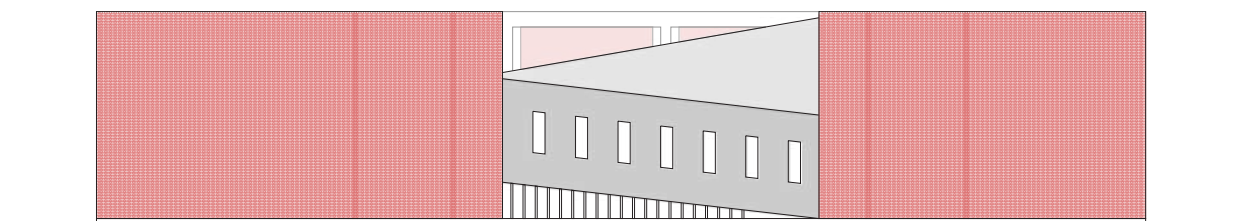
Front Elevation of the Clubhouse at Golf Course; Illustration showing the uninterrupted columns, extending to the roof
